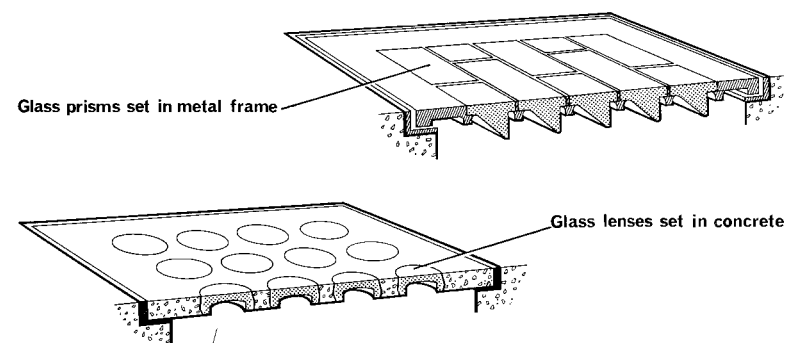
Two principal types of pavement light construction. Above: glass prisms in a metal frame. Below: glass lenses set in concrete.
